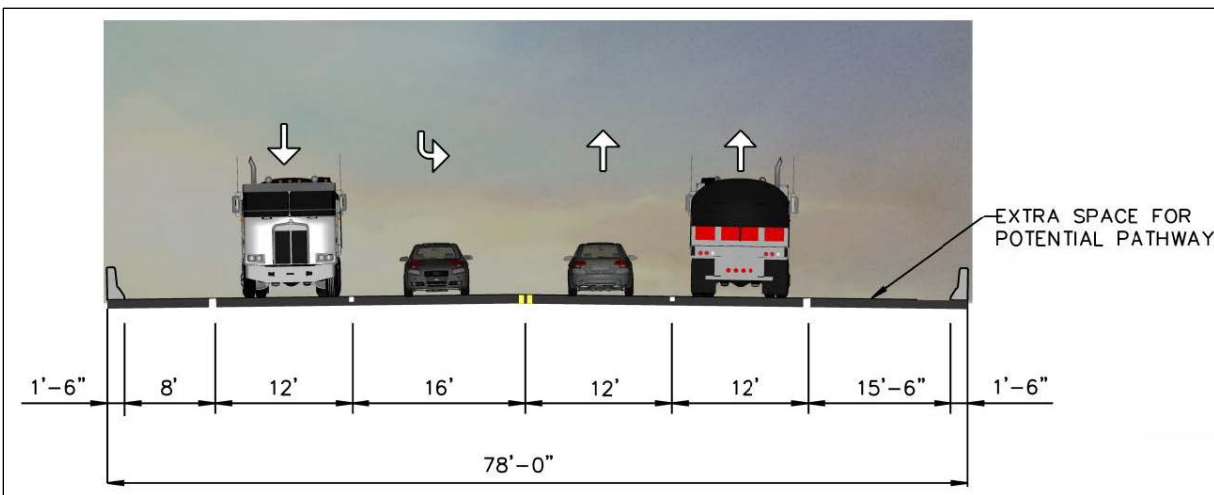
G South Alternative, new Kenai River Bridge cross section
